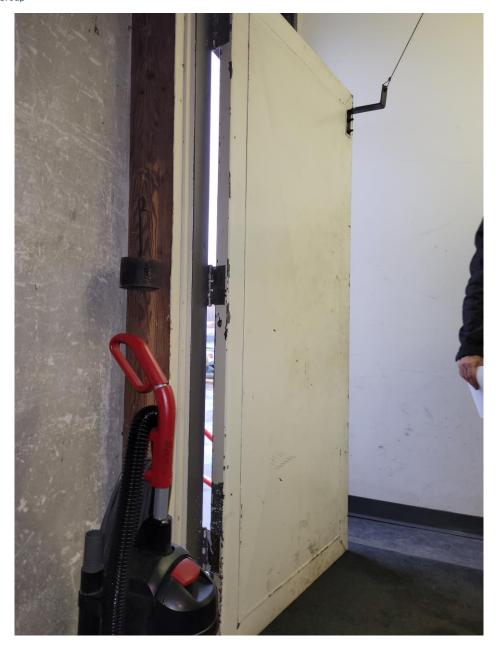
Fire door with presumed asbestos-containing lining & lead-based paint coatings. Lead based paint on plaster is pictured on the Hallway wall
